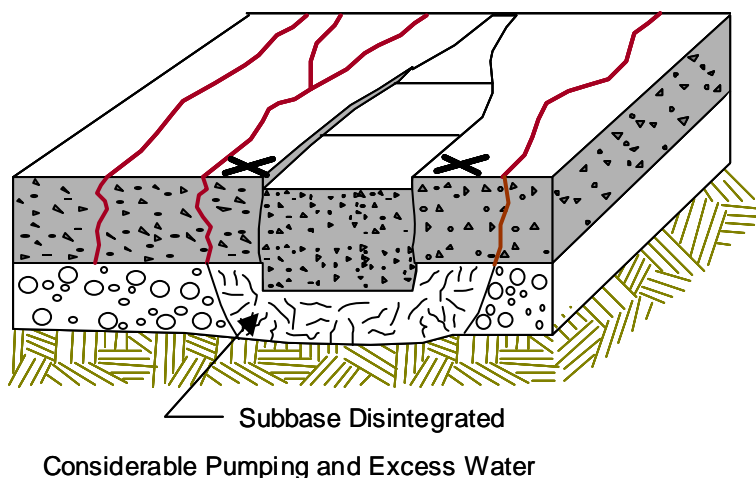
Potential deterioration of subbase near CRCP structural distress (punchout).
